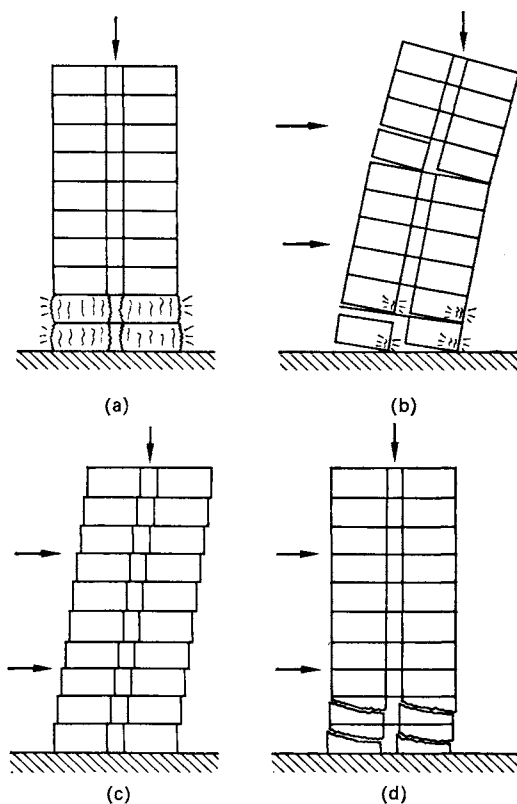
Possible modes of failure of brickwork structures: (a) compression in lower storeys due to dead load, (b) tension developing due to dead load and wind loading, (c) sliding of walls at floor levels due to wind loading, (d) shear or diagonal tension failure due to dead and wind loading.
